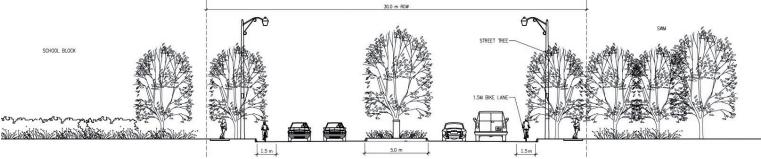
Community Gateway Concept Elevation - Castle Oaks Crossing
